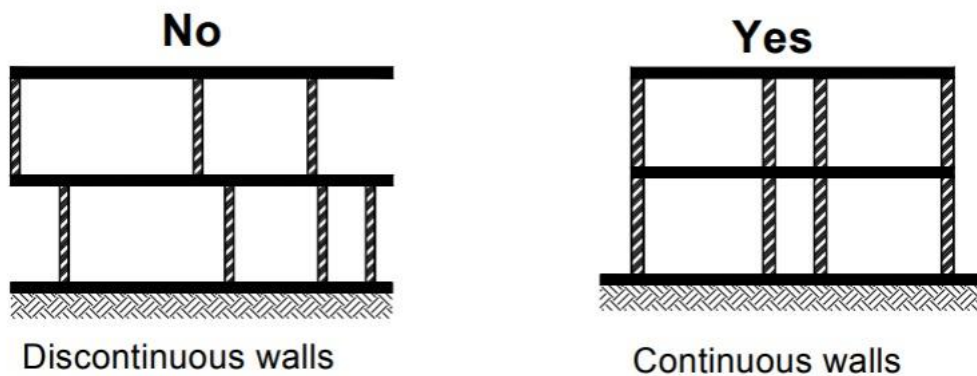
Continuity of walls up to the building height (*Hart & Quiun et al*).
